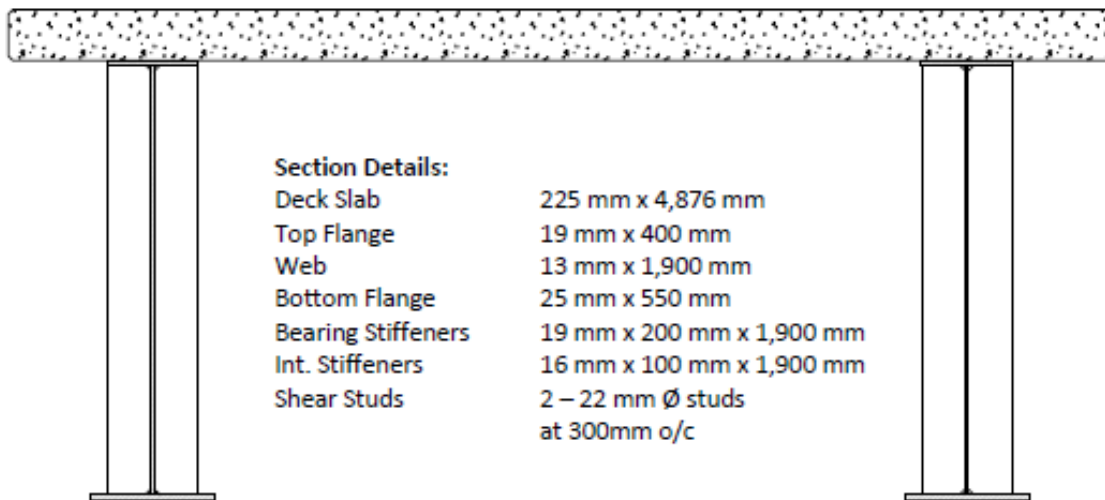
Cross-section Details of Twin Girder Composite Bridge [Bowser 2010]
